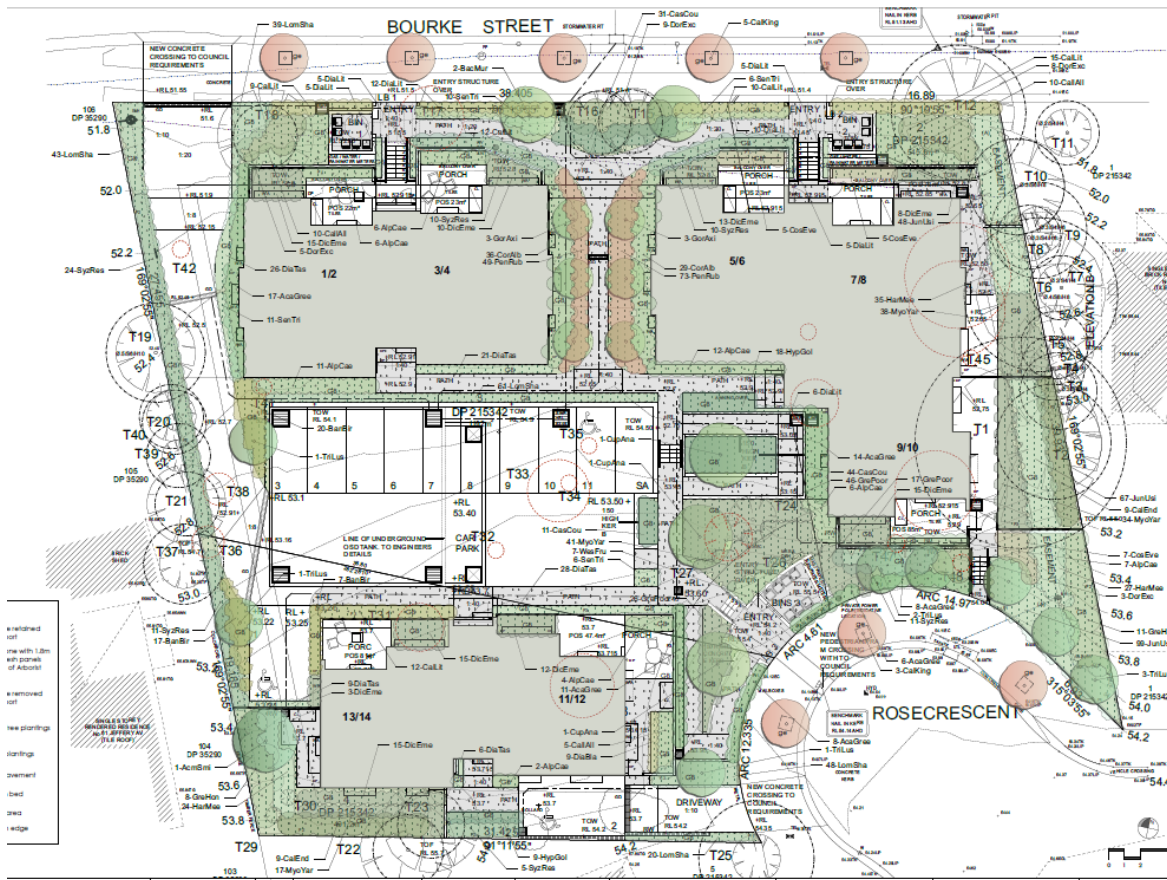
Landscape Plan (extract). Source: Greenland Design Pty Ltd
